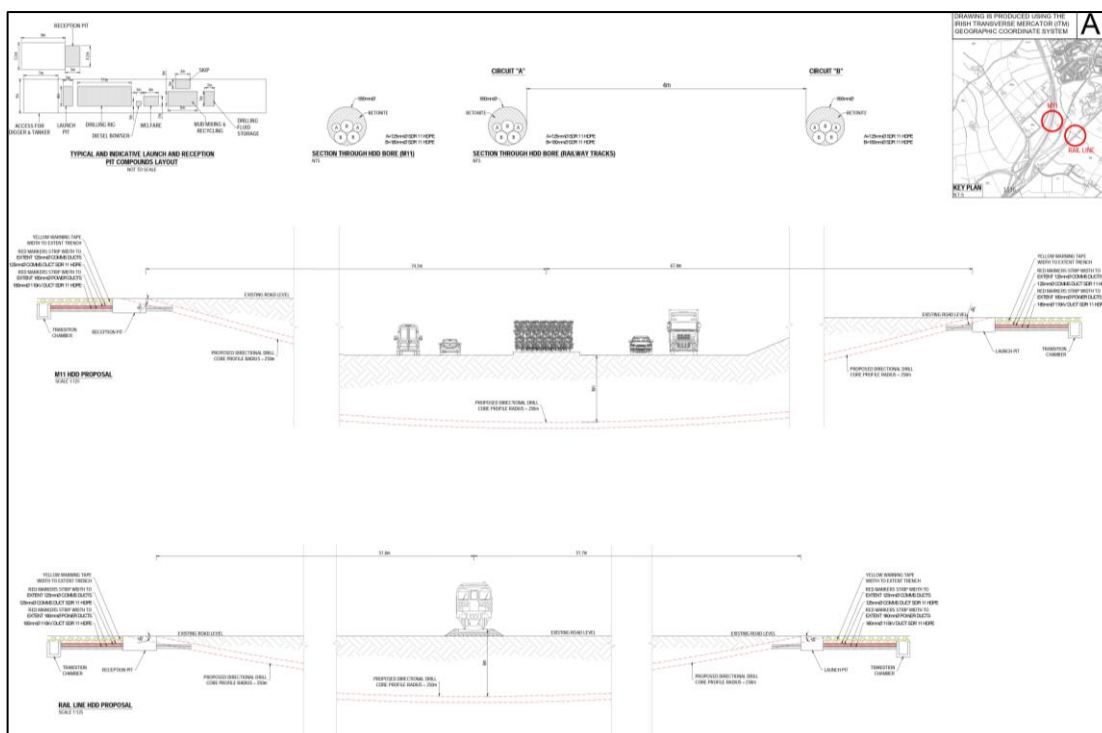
HDD Cable Cross Section (CSEA Sheet: 1535)
